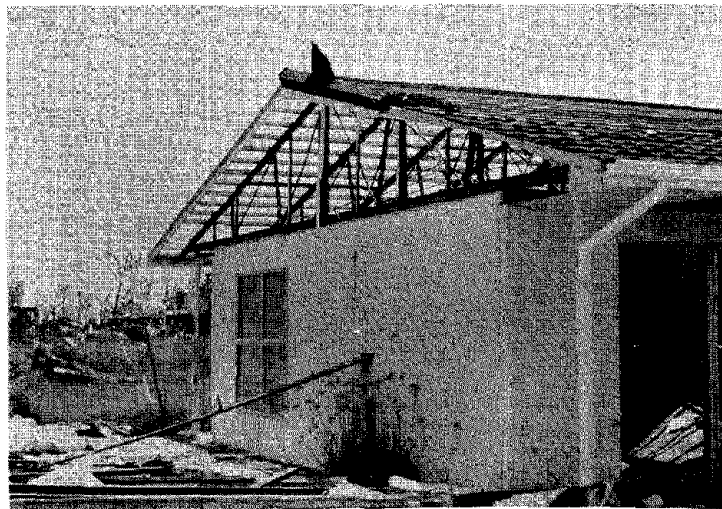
Prefabricated house with asbestos cement-polyurethane sandwich panels and steel wall and roof frames
